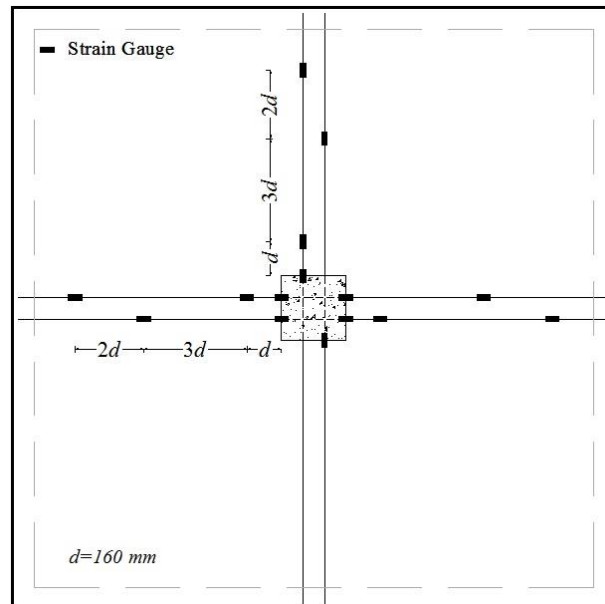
Typical strain gauges layout on the flexural reinforcement
